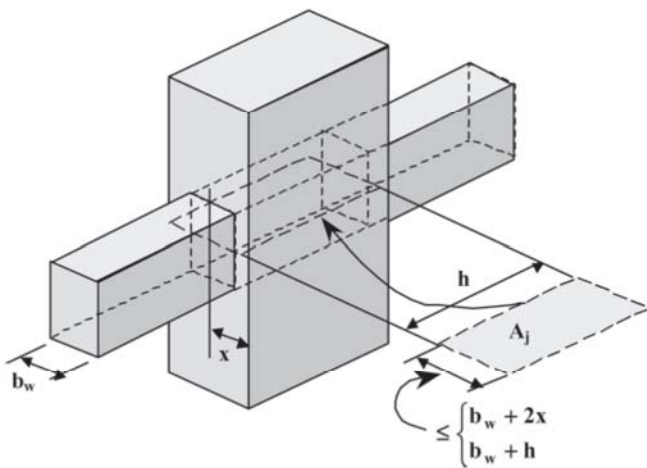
Definition of A_j for girder narrower than column.
